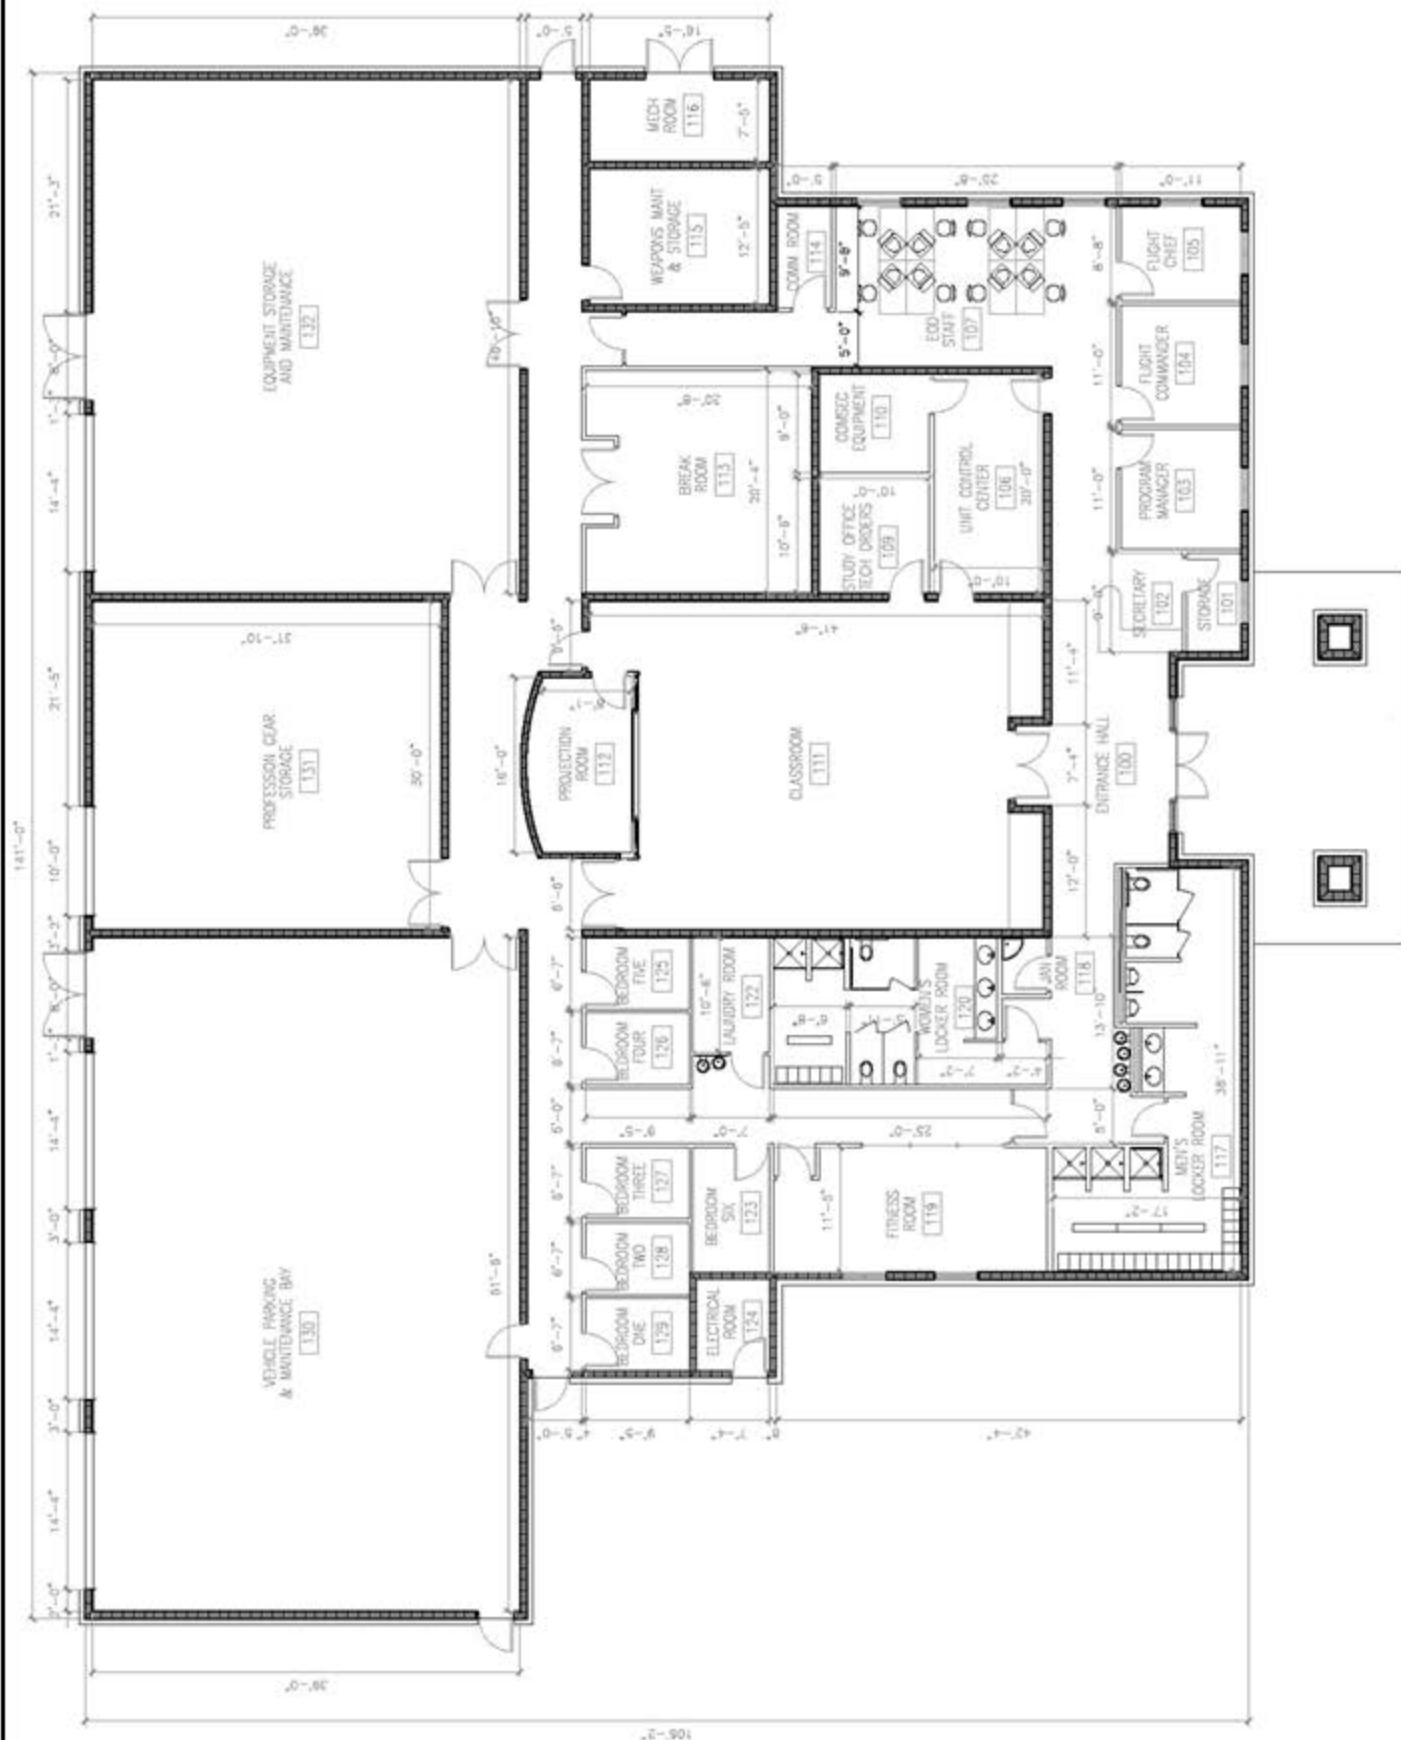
Conceptual Floor Plan for Proposed Permanent EOD Facility
